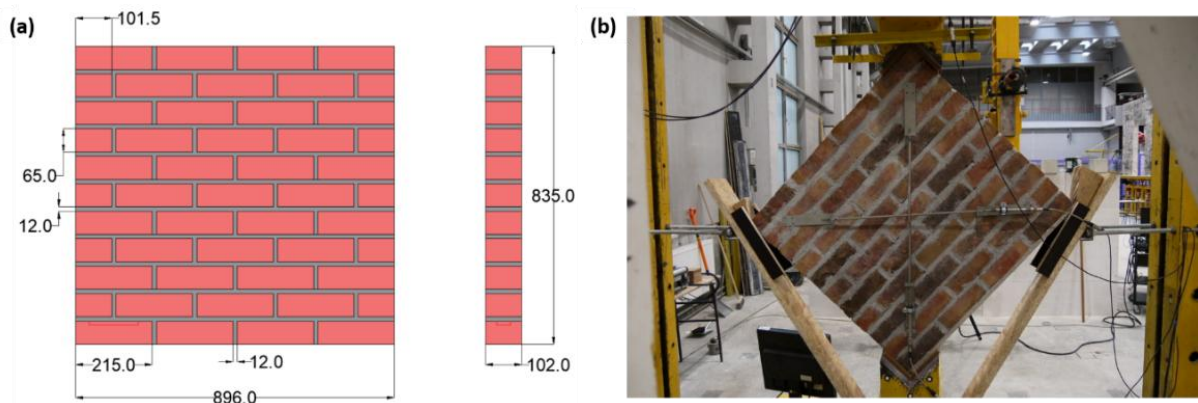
Dimensions of wallettes for diagonal compressive tests (a) and typical wallettes in the set-up before the tests (b).
